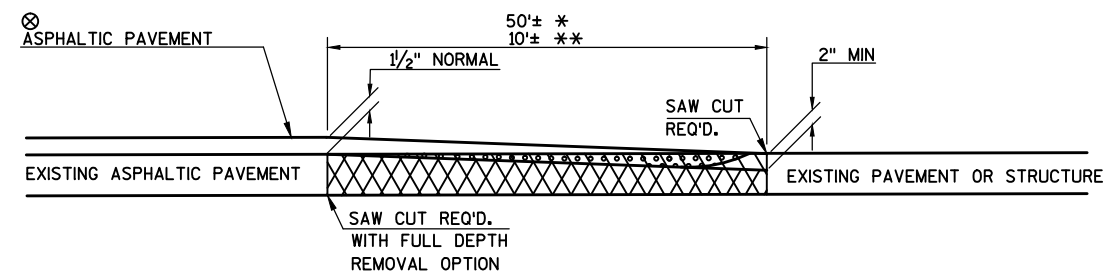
DETAIL FOR CULVERT REPLACEMENT IN PULVERIZE AREAS
